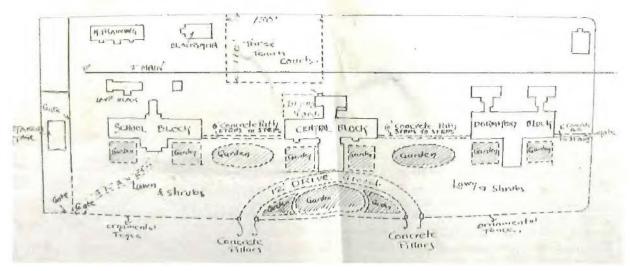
1920's sketch of the school site showing original building components and landscaping elements
